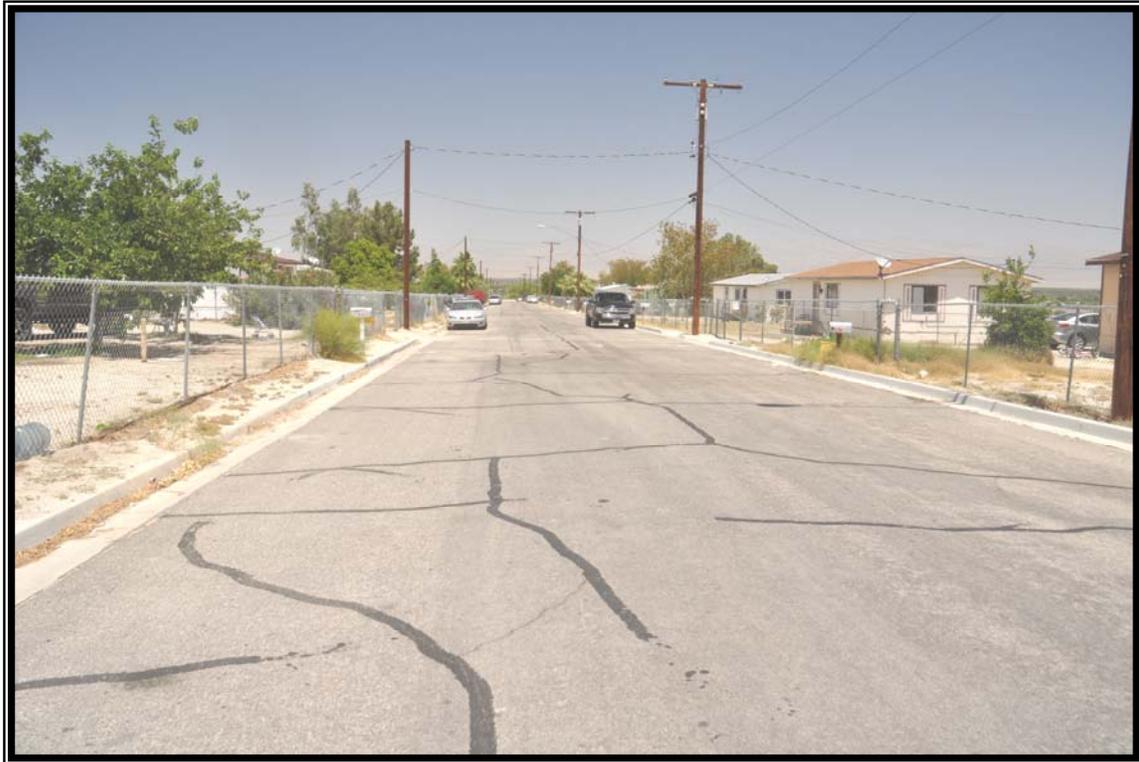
View north at the intersection of 64th Avenue and Landon Lane (2403).
